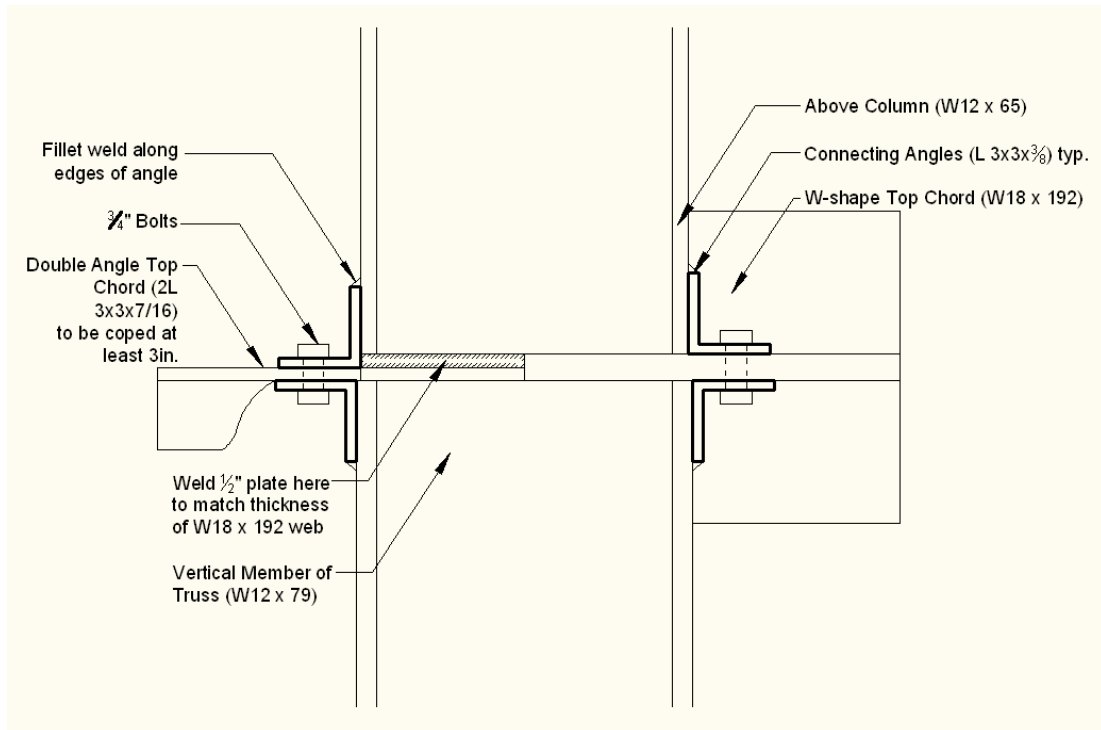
Alternative 3 Member A-Member B with Above Column and Vertical Member Cross Section
